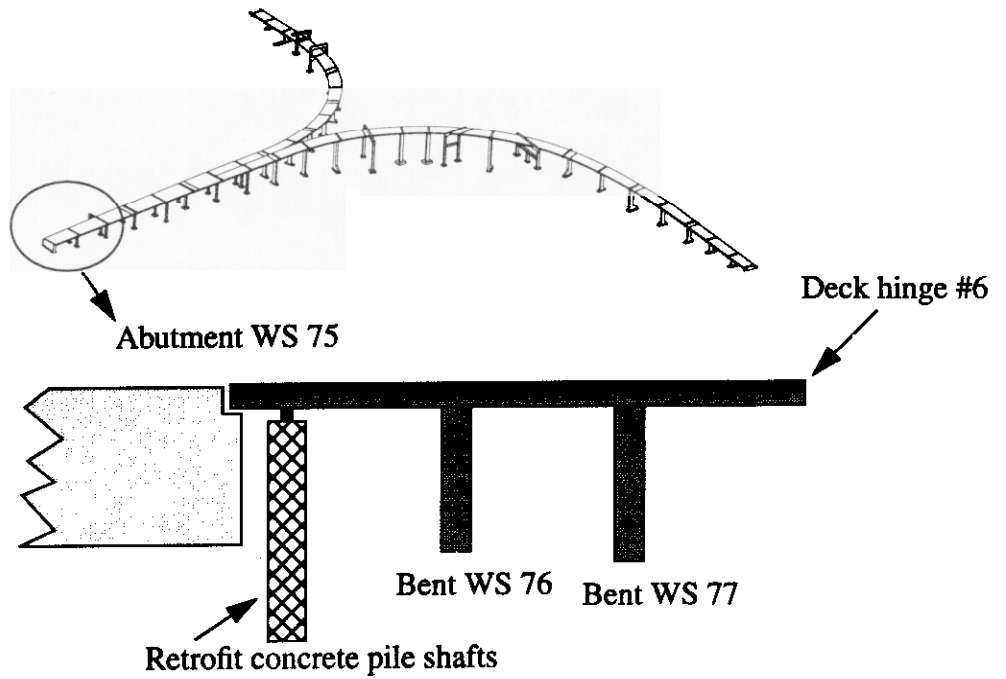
Strengthening by addition of two stiff concrete members at WS 75.
